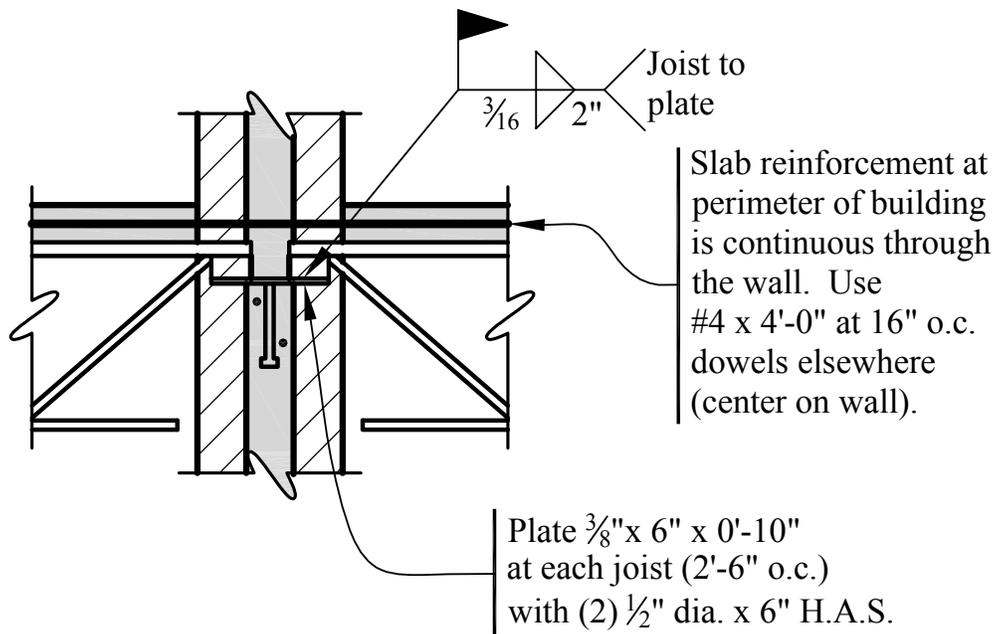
Floor anchorage to wall (1.0 in. = 25.4 mm, 1.0 ft = 0.3048 m).
